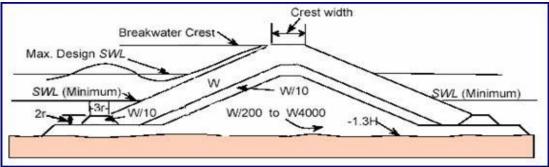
Typical Cross Section of Rubblemound Breakwater
